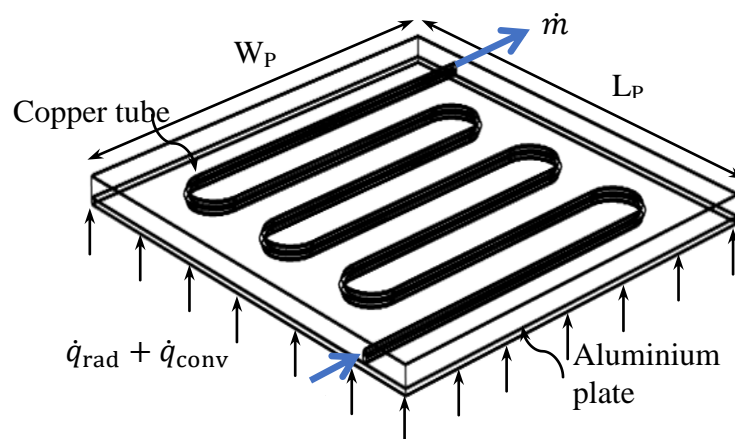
Scheme of a typical SRCP system made of a copper tube placed above an aluminium plate (adapted from [19])
